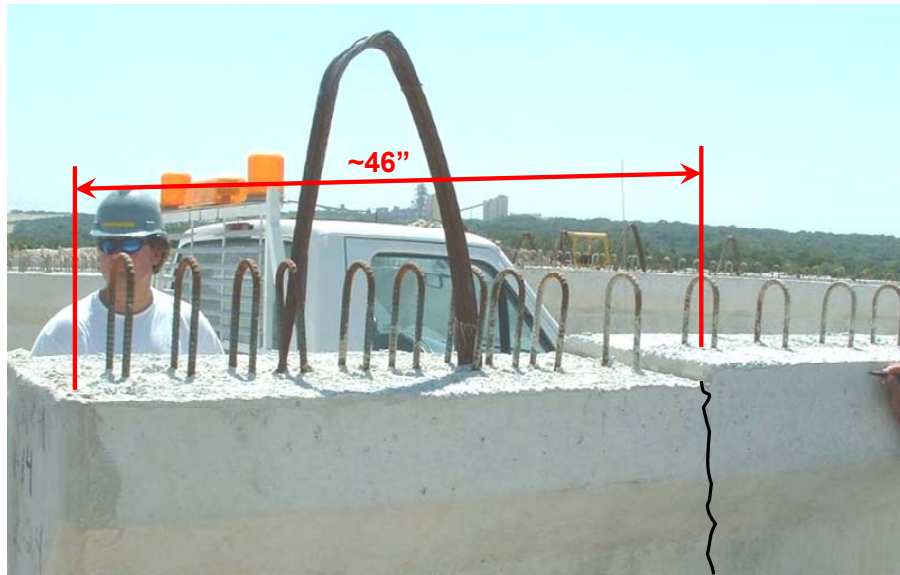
Cracking in the end of a Type IV beam, with block-out.
